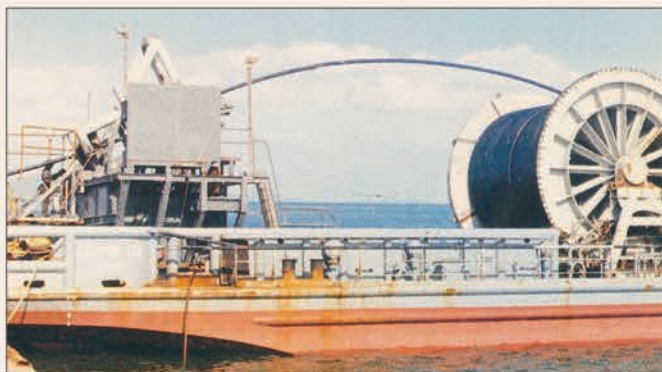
114mm diameter steel pipe coated with FBPE being reeled onto a large barge – circa 1979.
